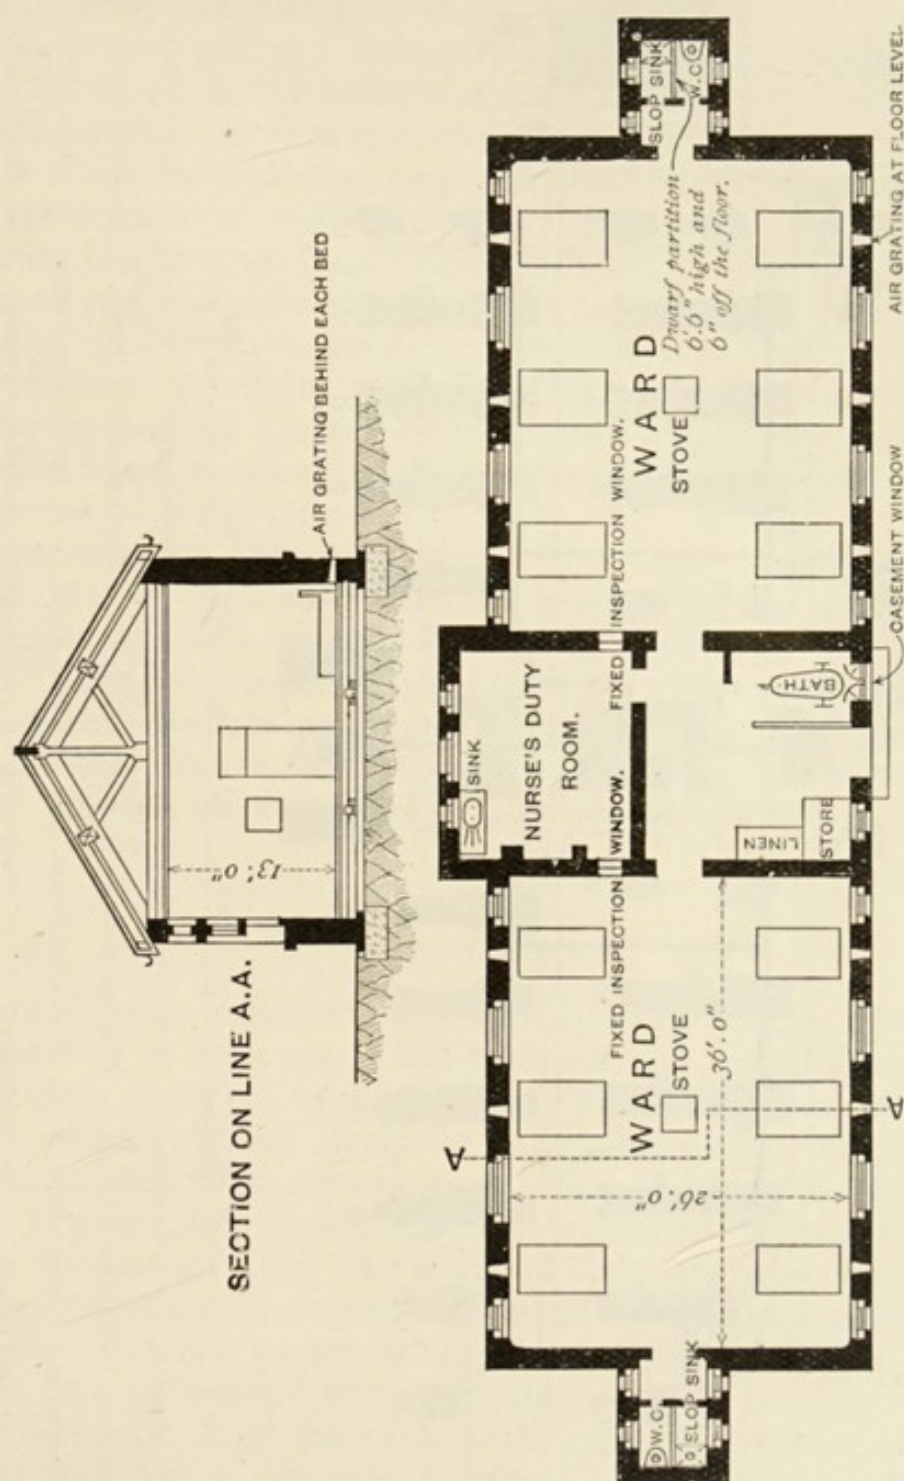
Plan of a ward pavilion in an isolation hospital (L.G.B. model), section on line A A.
